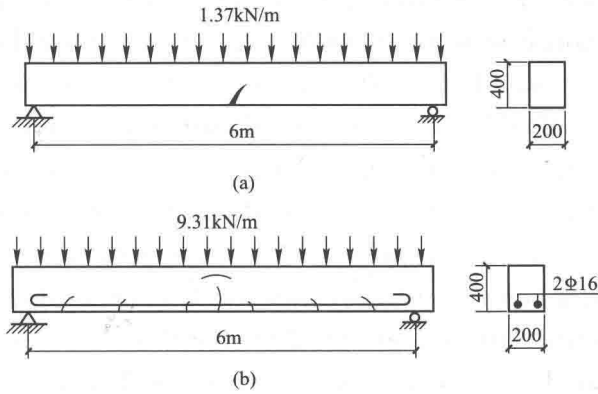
Plain concrete beam and reinforced concrete beam
